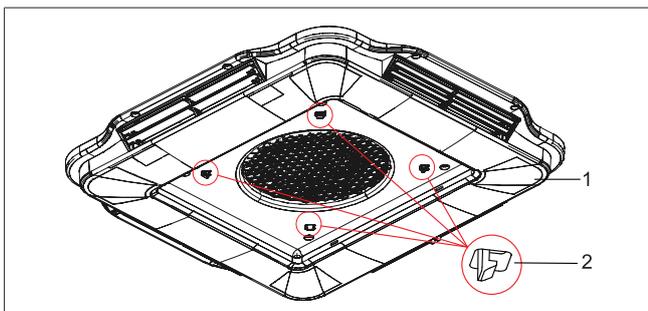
Attaching the air distributor assembly to the mounting bracket
